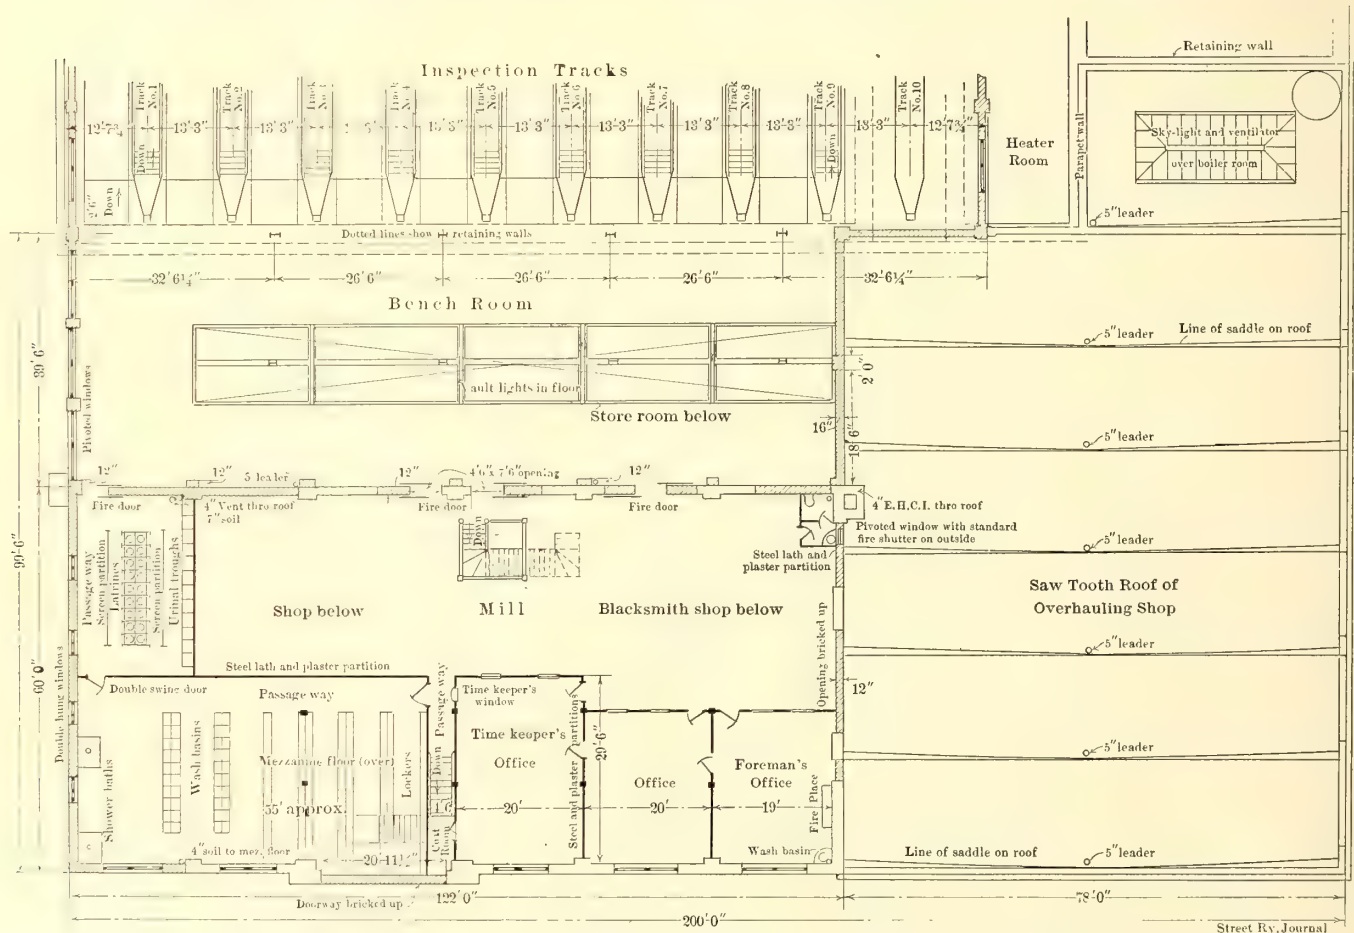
GENERAL PLAN OF TRACK-LEVEL FLOOR, SHOWING ALSO THE ROOF OF OVERHAULING SHOP AND HEATING PLANT
